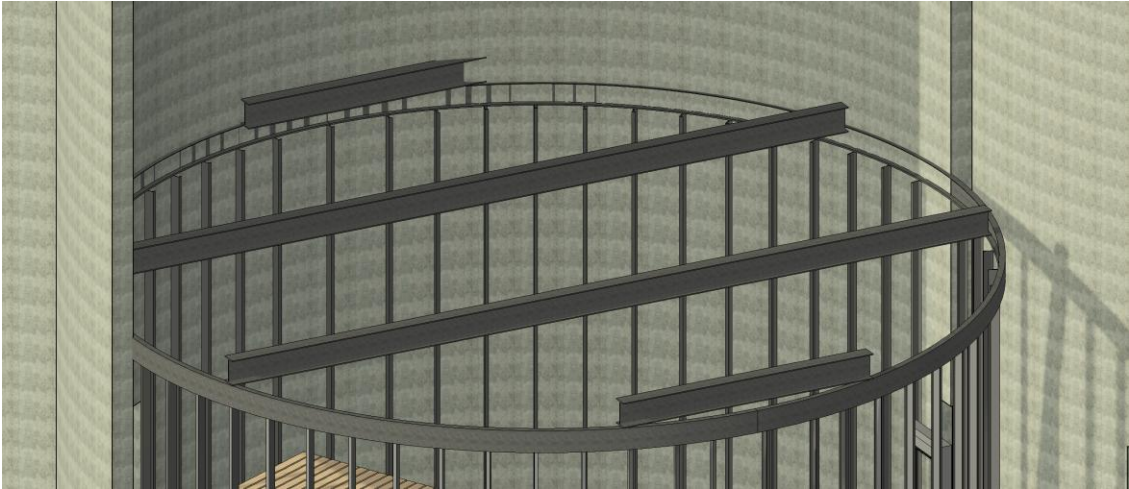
Perimeter C-Channel & Wide Flange Floor Framing
